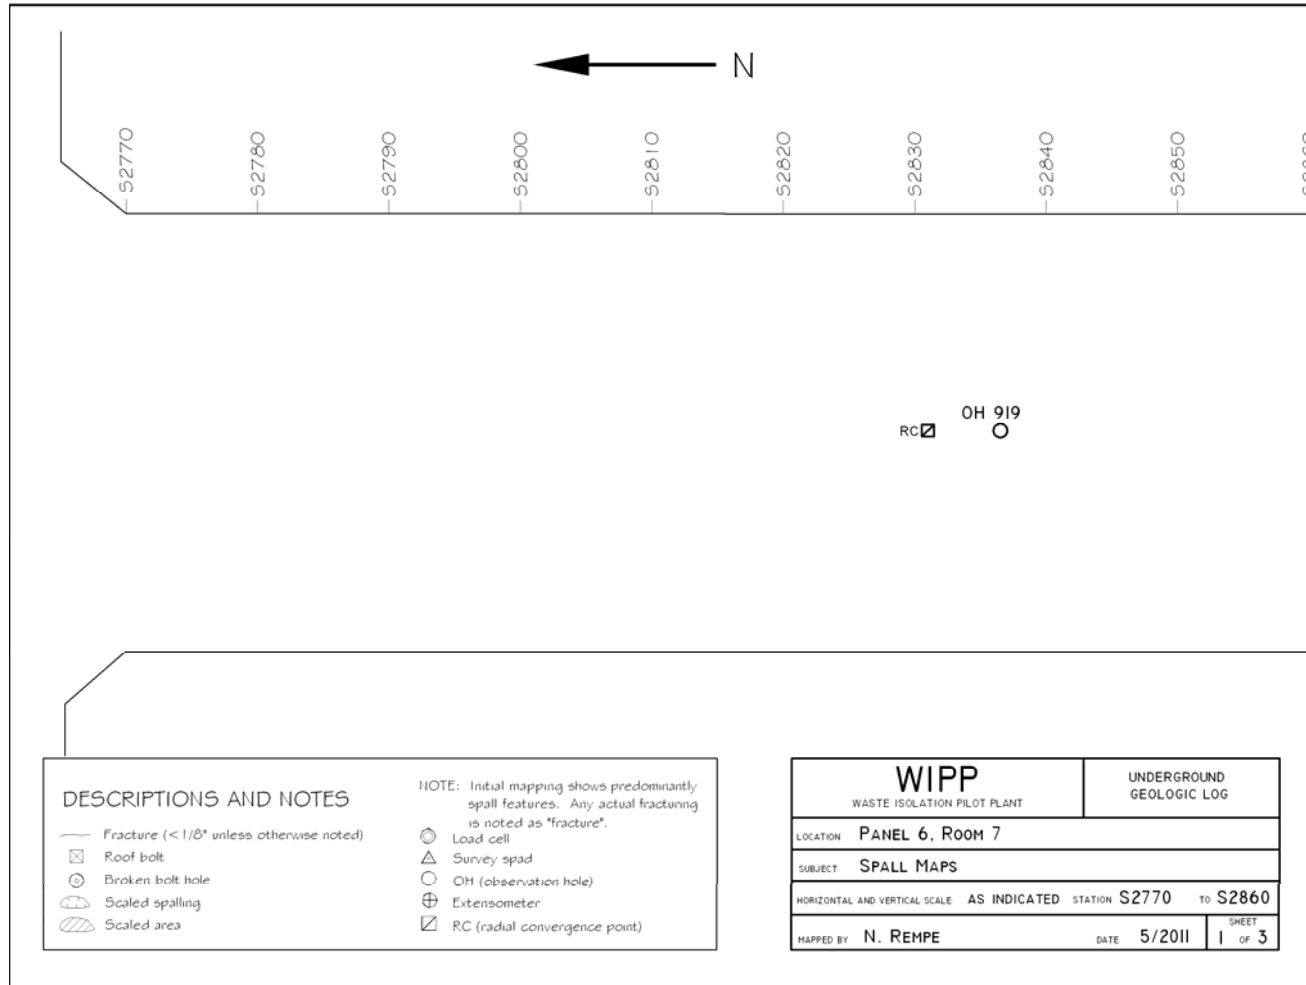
Panel 6 Room 7, S2770-S3060 Roof Fractures (Sheet 1 of 3)
